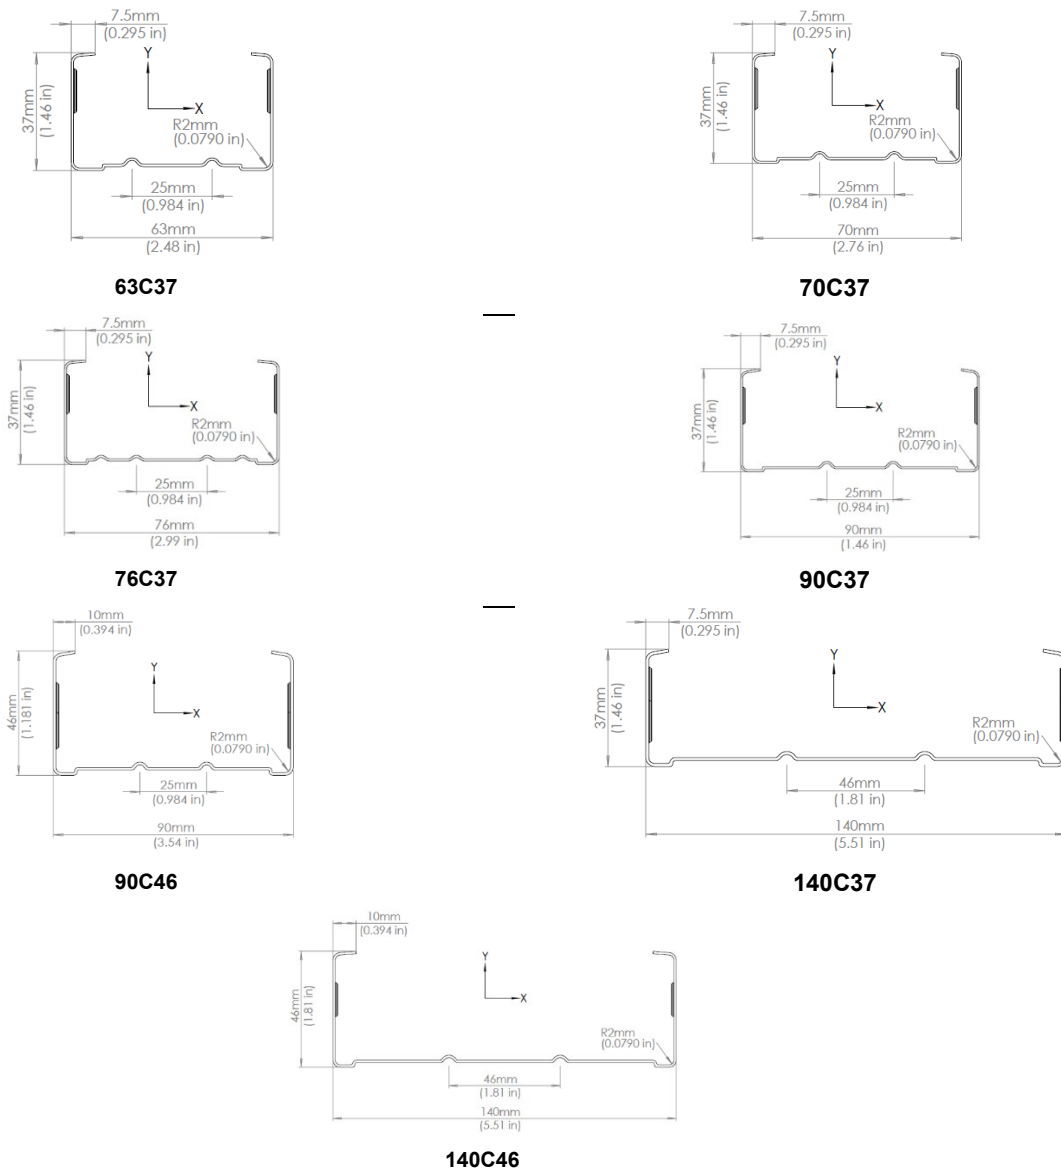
COLD FORMED STEEL FRAMING MEMBER SECTIONS
